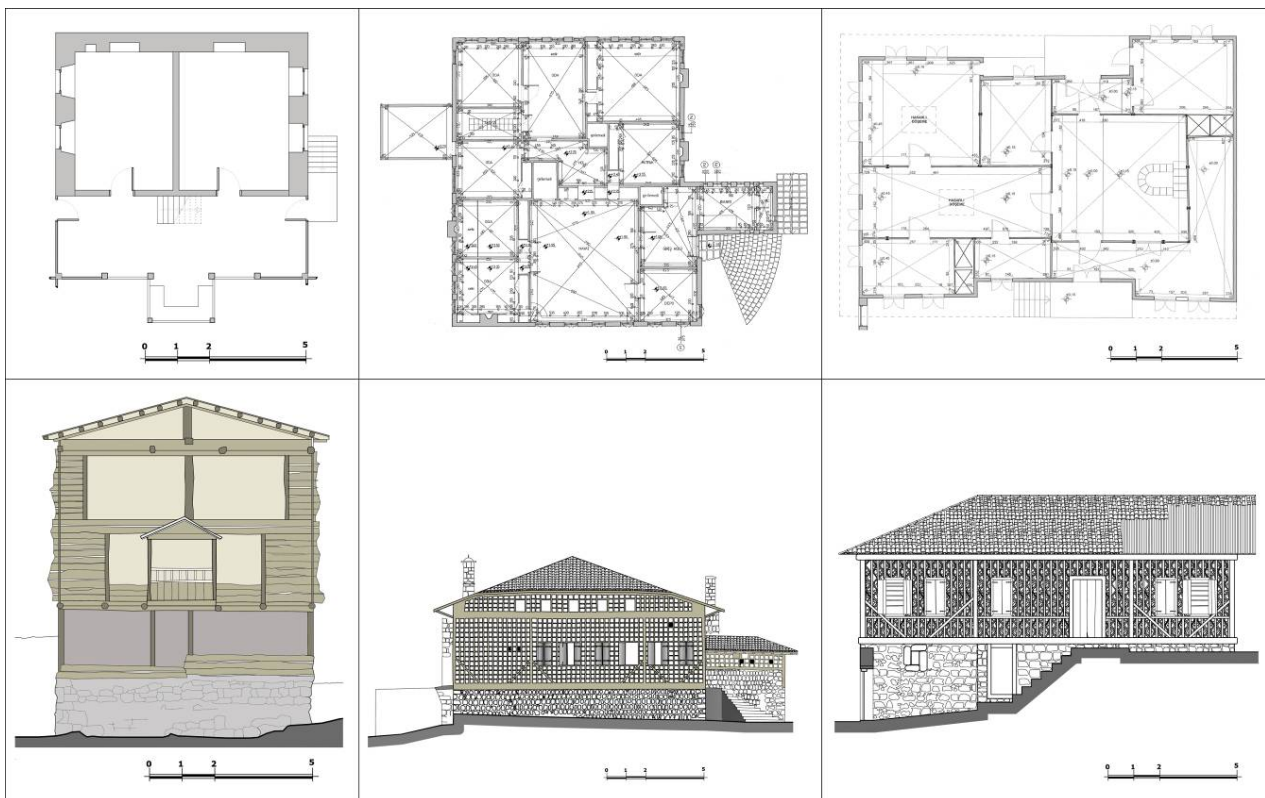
The plans and façade examples of the vernacular houses from Artvin, Rize, and Trabzon.
